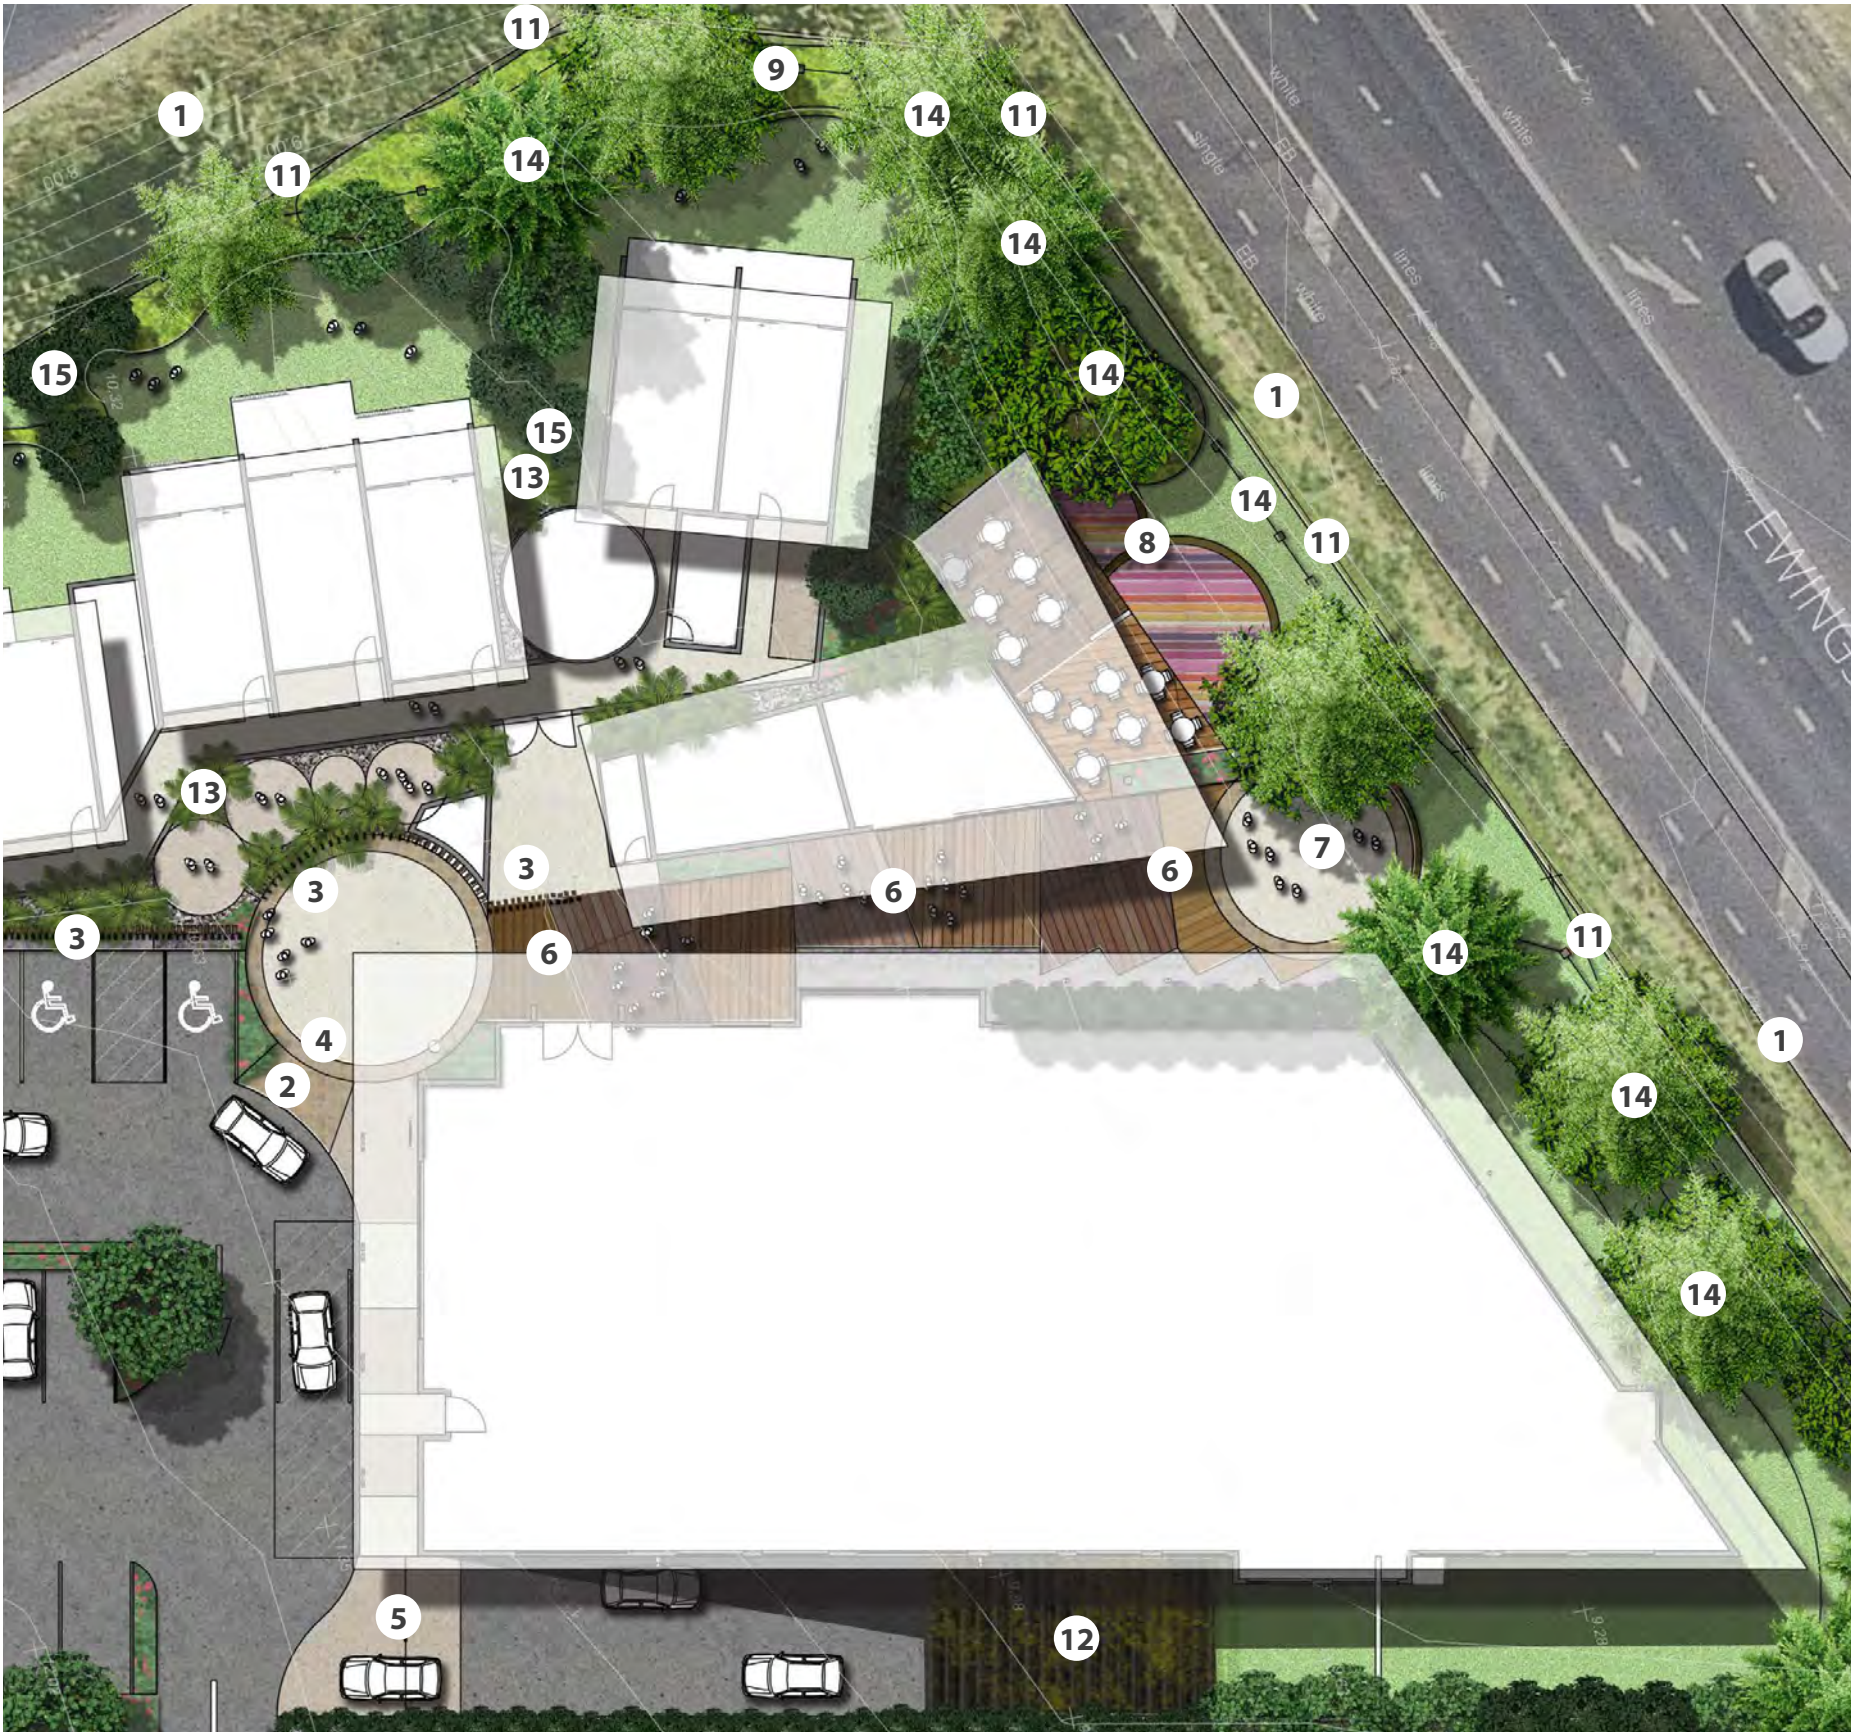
STATEMENT OF LANDSCAPE INTENT - GROUND LEVEL DETAIL PLAN
